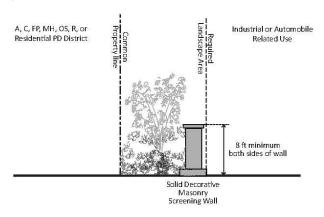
H: WALLS BETWEEN INDUSTRIAL AND OTHER DISTRICTS
